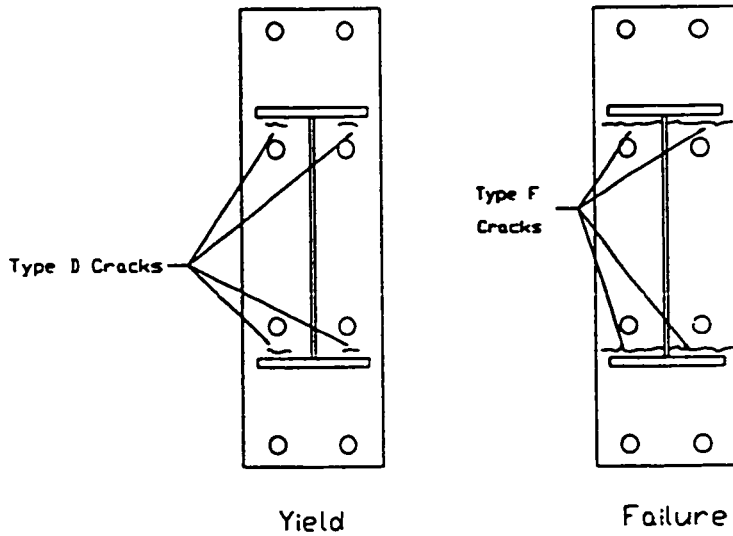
Crack Locations at Yield and Failure for Connection B-2
